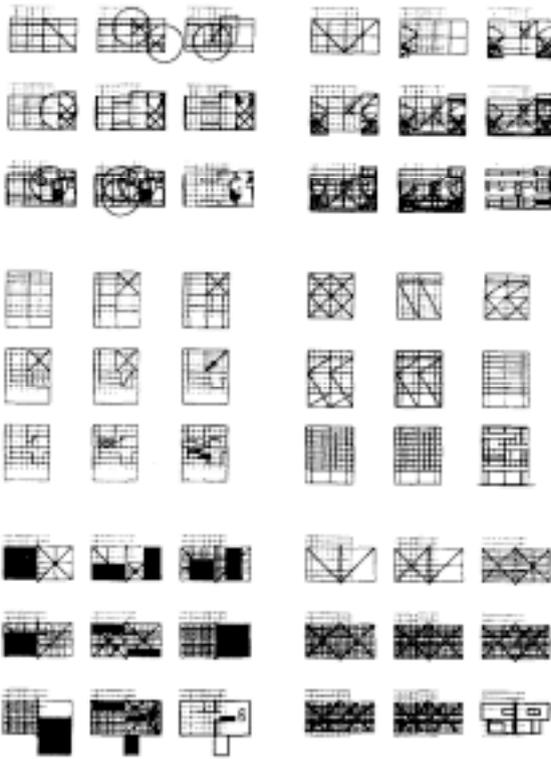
Top: Maison Canale, 1924, plan (left) and elevation (right); Regulating Lines Inferred from Plan and Elevation. Middle: Villa Baizeau, 1928, plan (left) and elevation (right); Regulating Lines Inferred from Plan and Elevation. Bottom: Maison Jacquin, 1928, plan (left) and elevation (right); Regulating Lines and Emerging Shapes Inferred from Plan and Elevation
